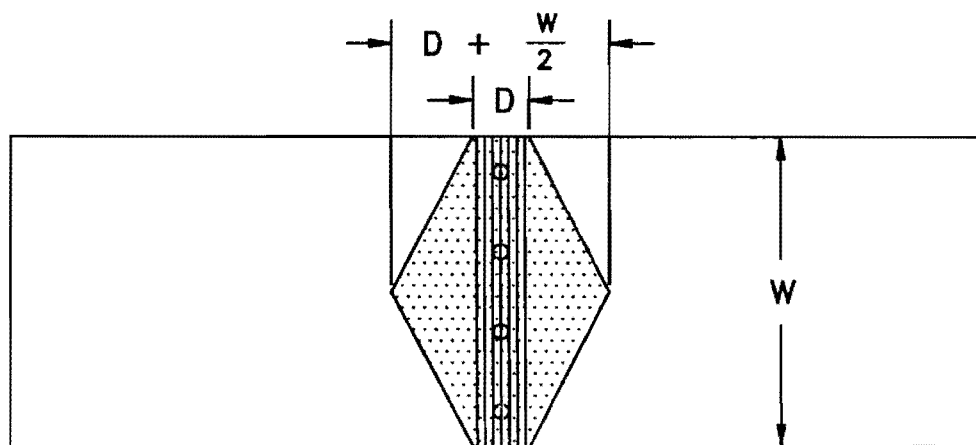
Thin Slab Bridge with Banded Transverse Prestressing
